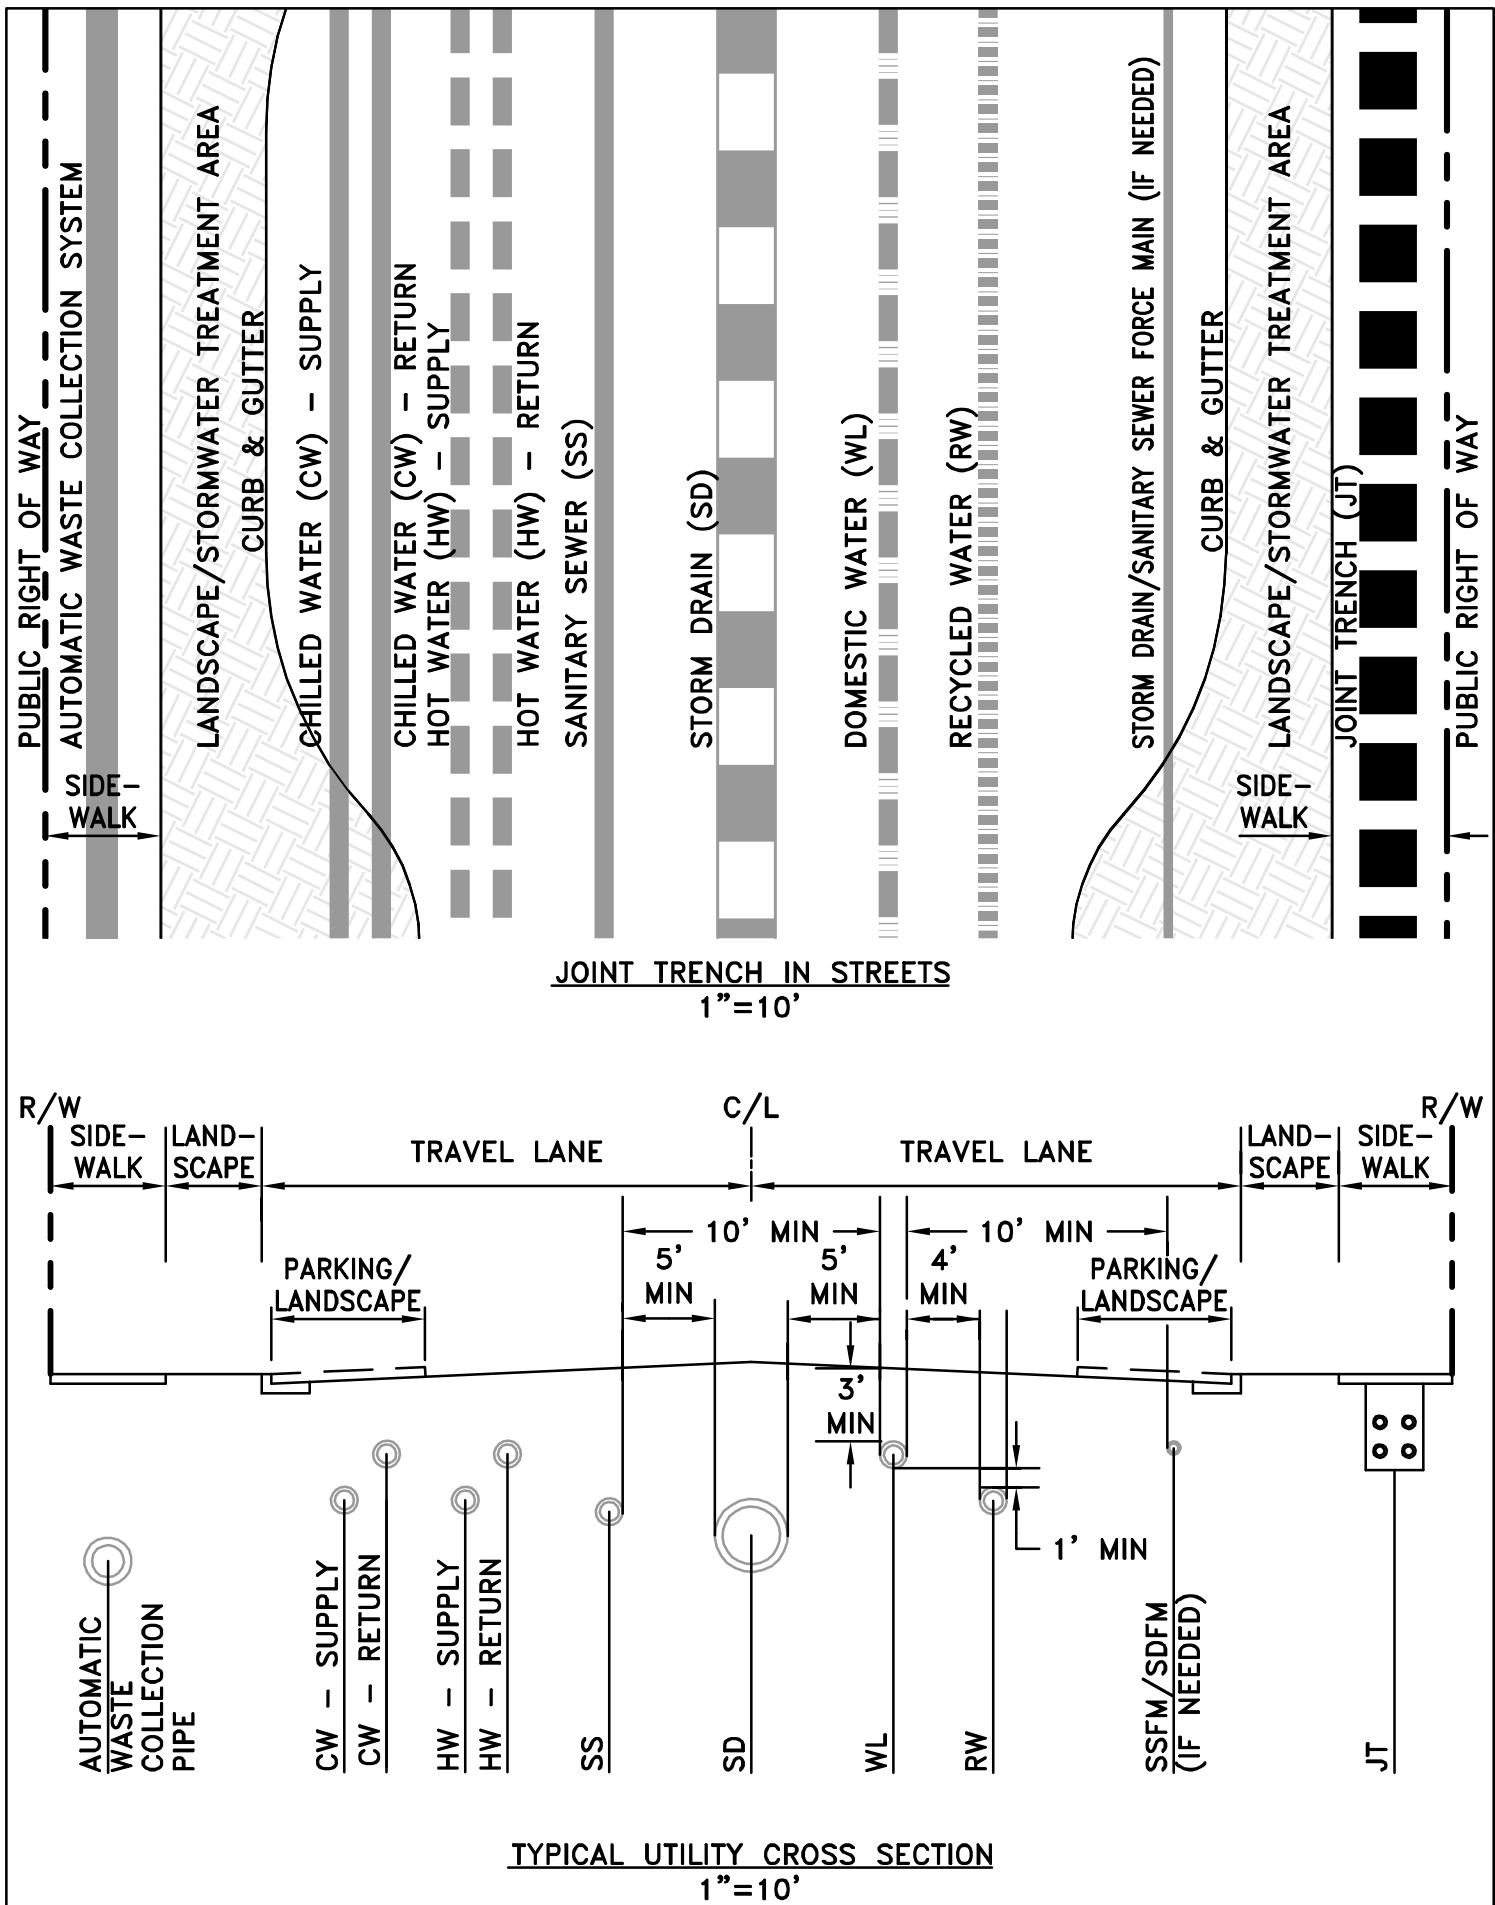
Detail of Joint Trench System Location in Streets
